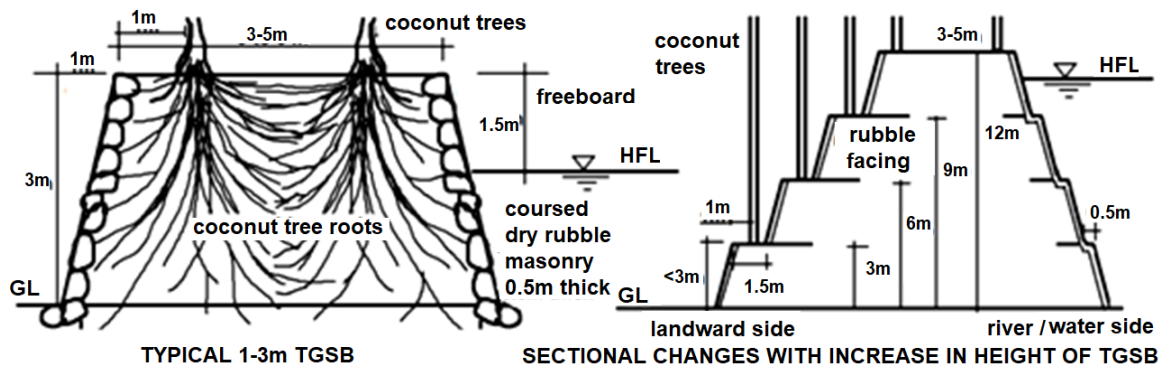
TGSB (a) Typical section (b) Change in section with height showing benching
